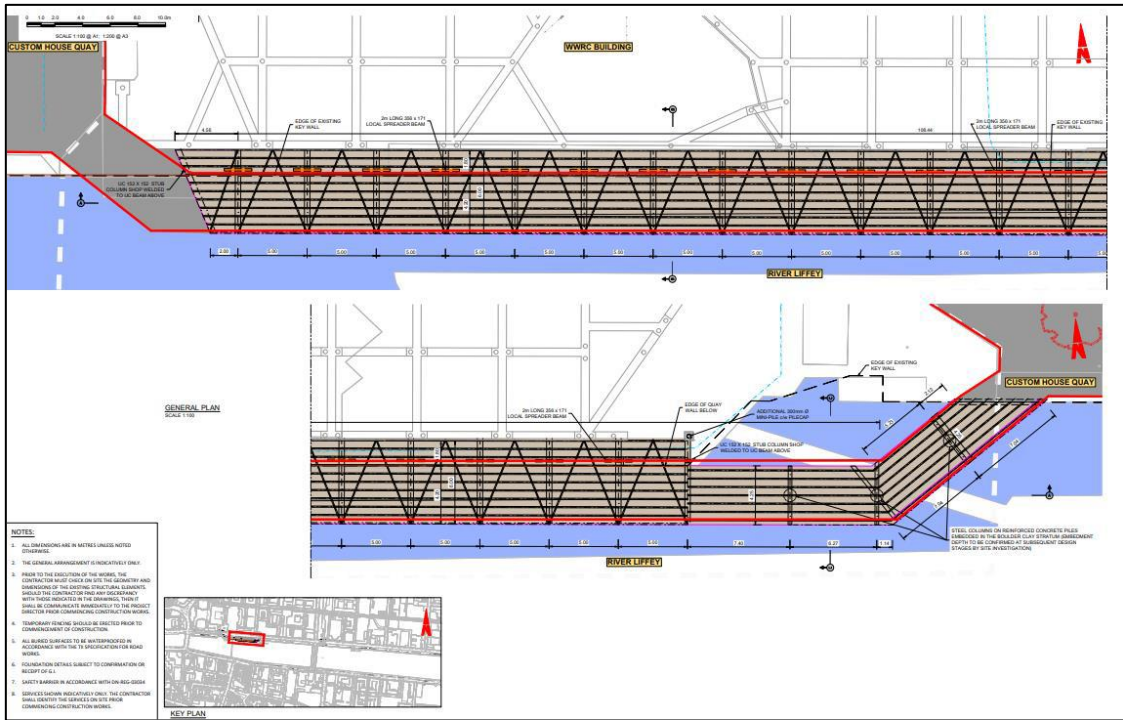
Plan view of proposed boardwalk structure at Area B.
